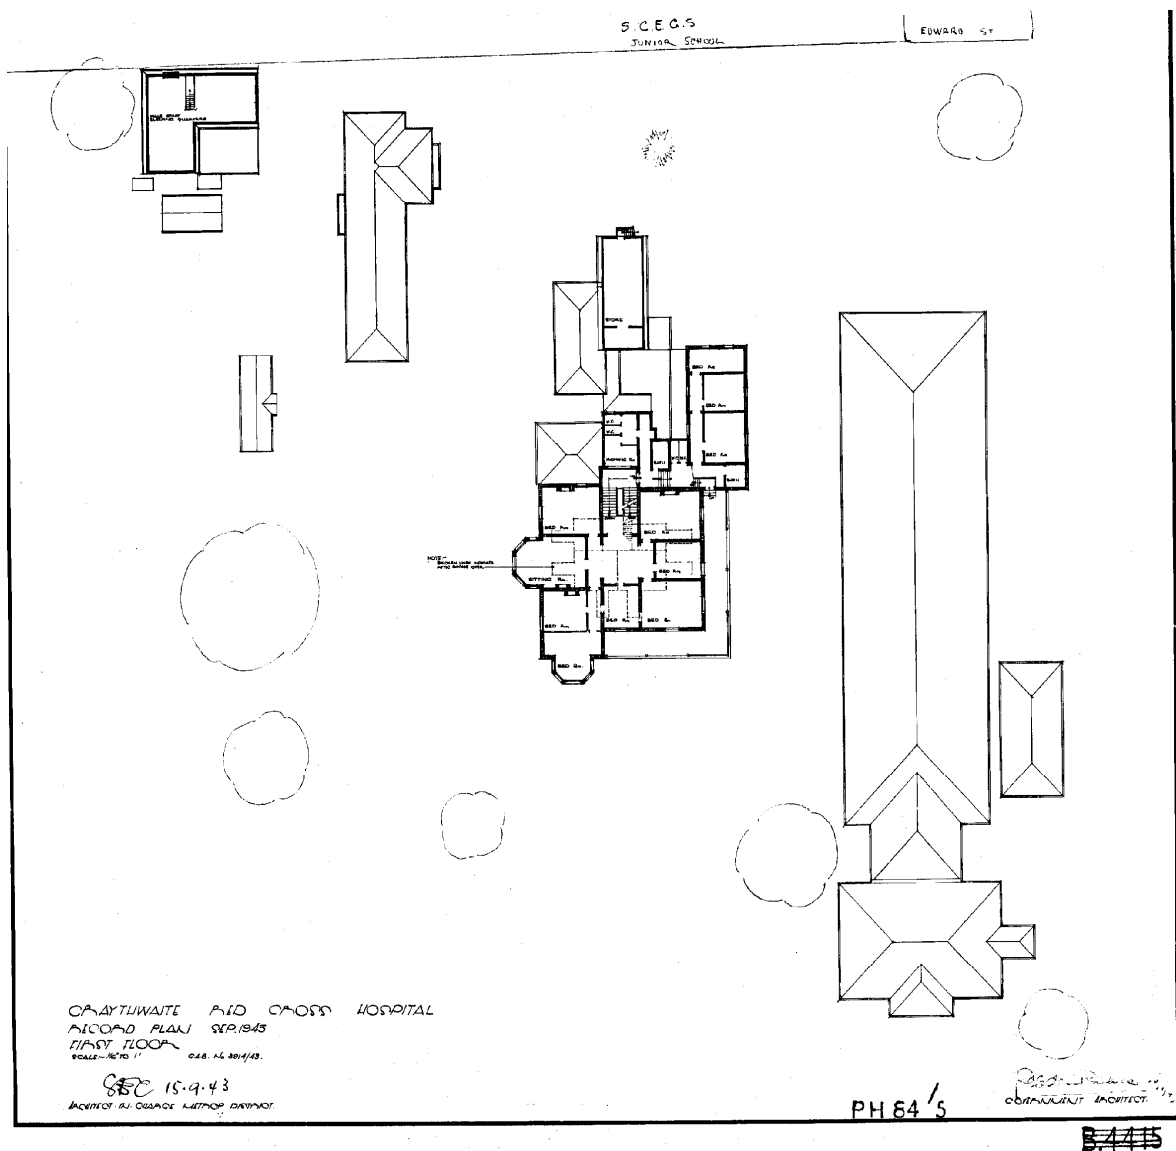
The background to the preparation of this 1943 site plan by the NSW Government Architect is not known but it was probably done for a proposed site development by the Red Cross. The drawing shows the ground floor layout of the outbuildings and room uses.
